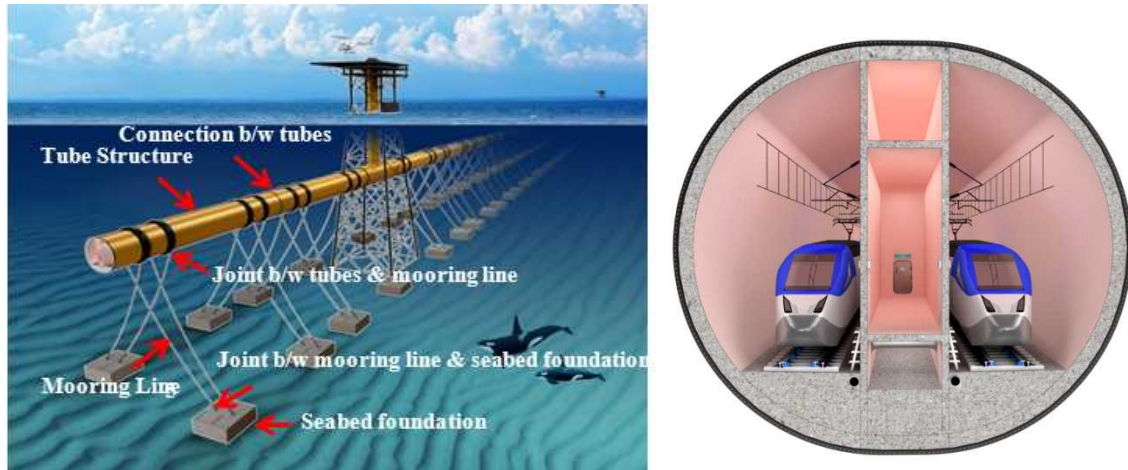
Pipe-line shaped SFR indicating system items and the cross-section of SFR
